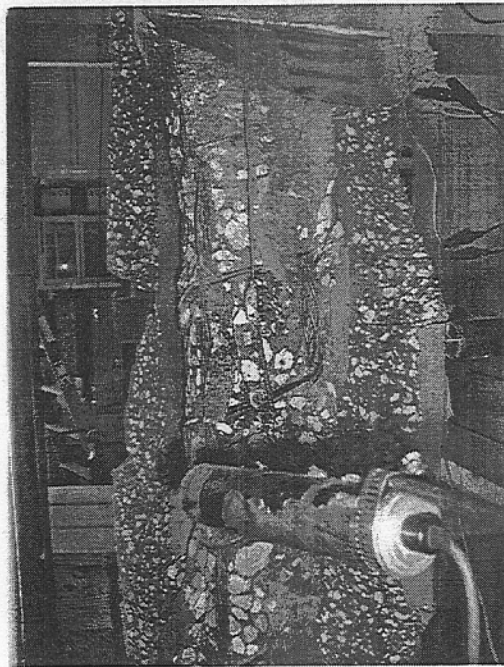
Failure Mode of PROTECRET Specimen Under Axial Loads.
